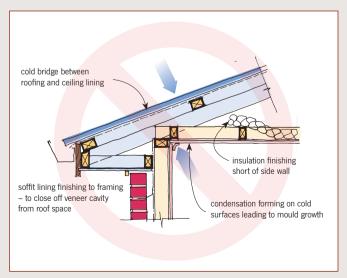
The cause of mould on the walls and ceiling - lack of insulation.
